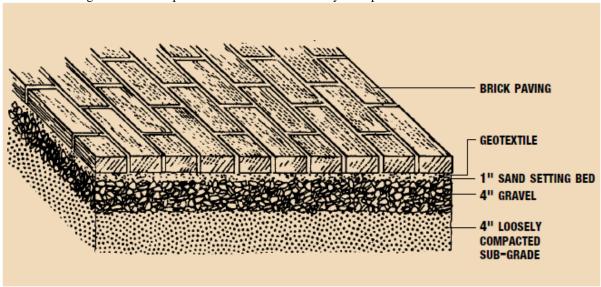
Brick patios and sidewalks can be designed to reduce soil compaction and root pruning.
